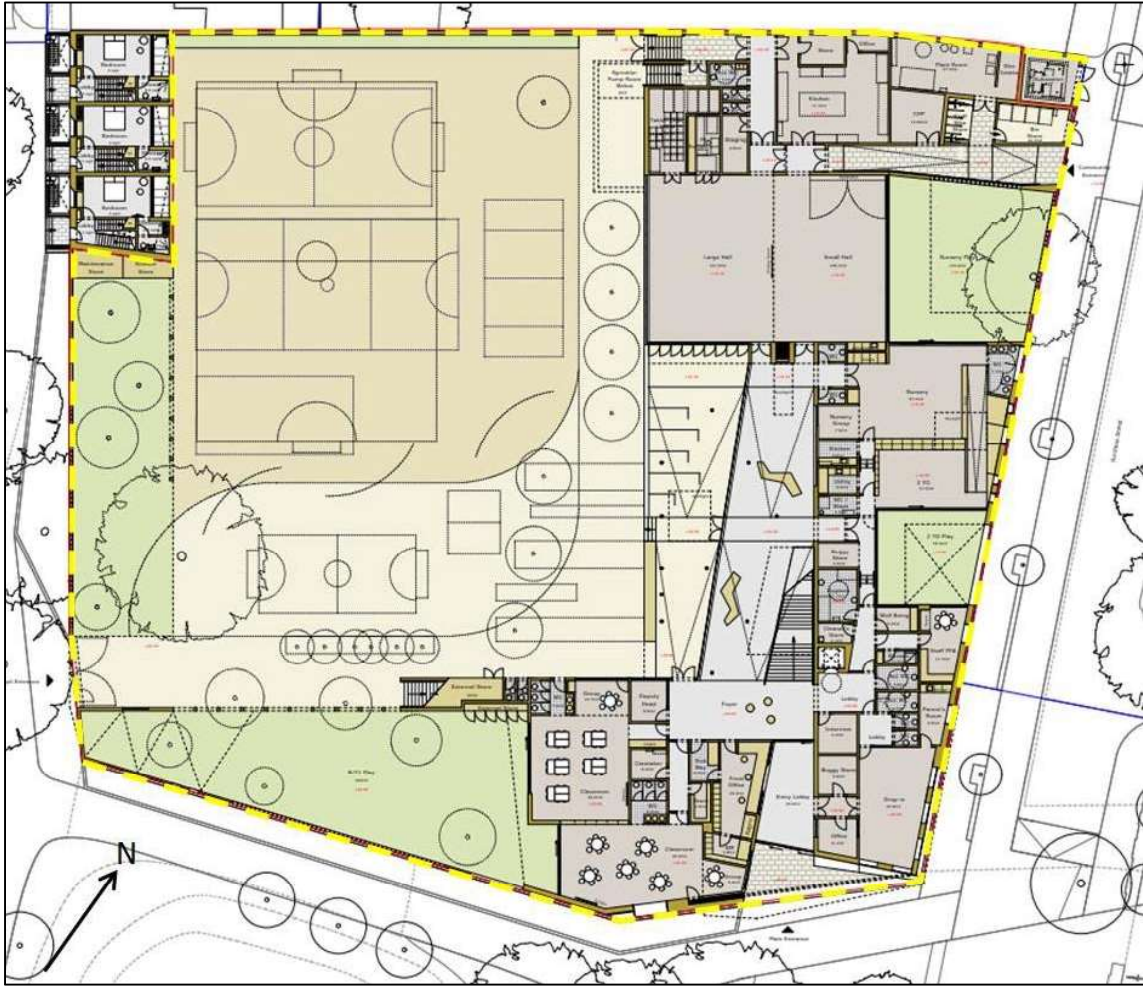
Ground floor plan of proposed Plot 4 development. Drawing correct as at 28/10/2015 – coordination issue
